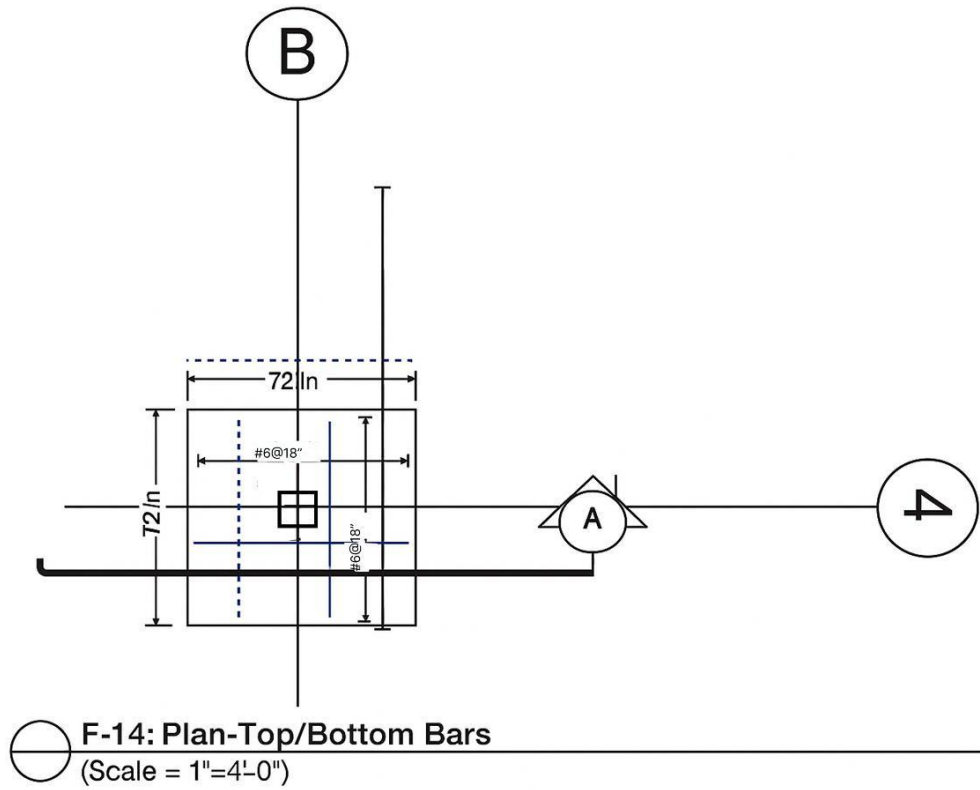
Footing F-14 Plan -Top/ Bottom Bars (72"X72"), Height 12"
